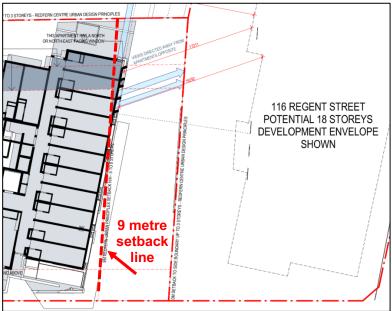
Proposed Revised Typical Tower Plan showing setbacks and window treatments on eastern elevation. (source AJ+C Architects Revised Supplementary Design Report)
